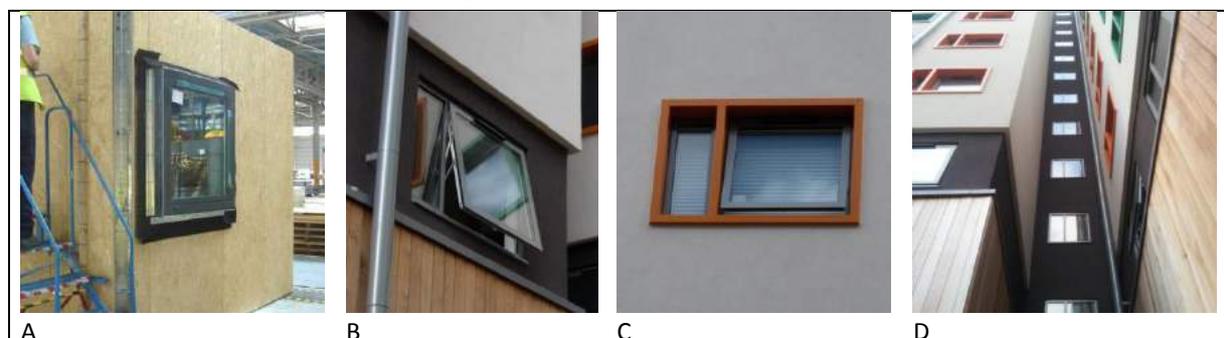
Window in bedroom module, not recessed in facade (A), Bedroom window recessed in facade showing the extent of window opening (B), Bedroom window in planar facade— extent of window opening (C), Stair core, fixed, opaque windows with large bedroom windows left & right (D)
